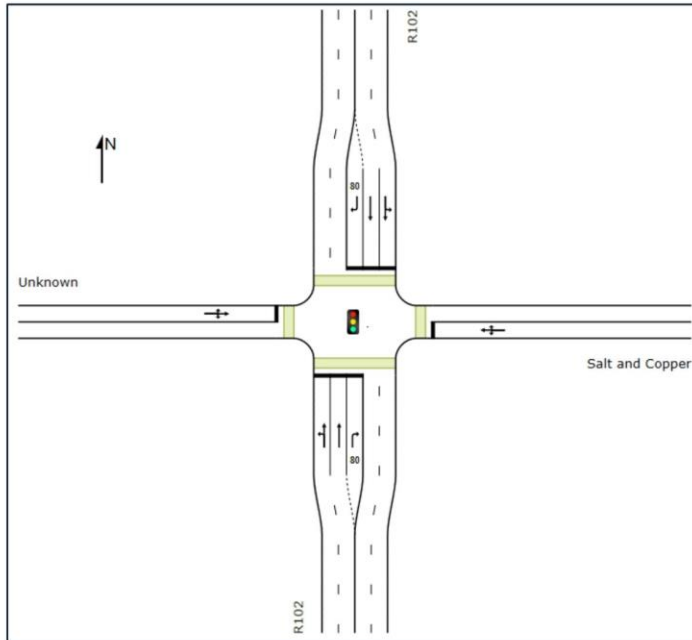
R102 and Planned New Access Road A Proposed Intersection
